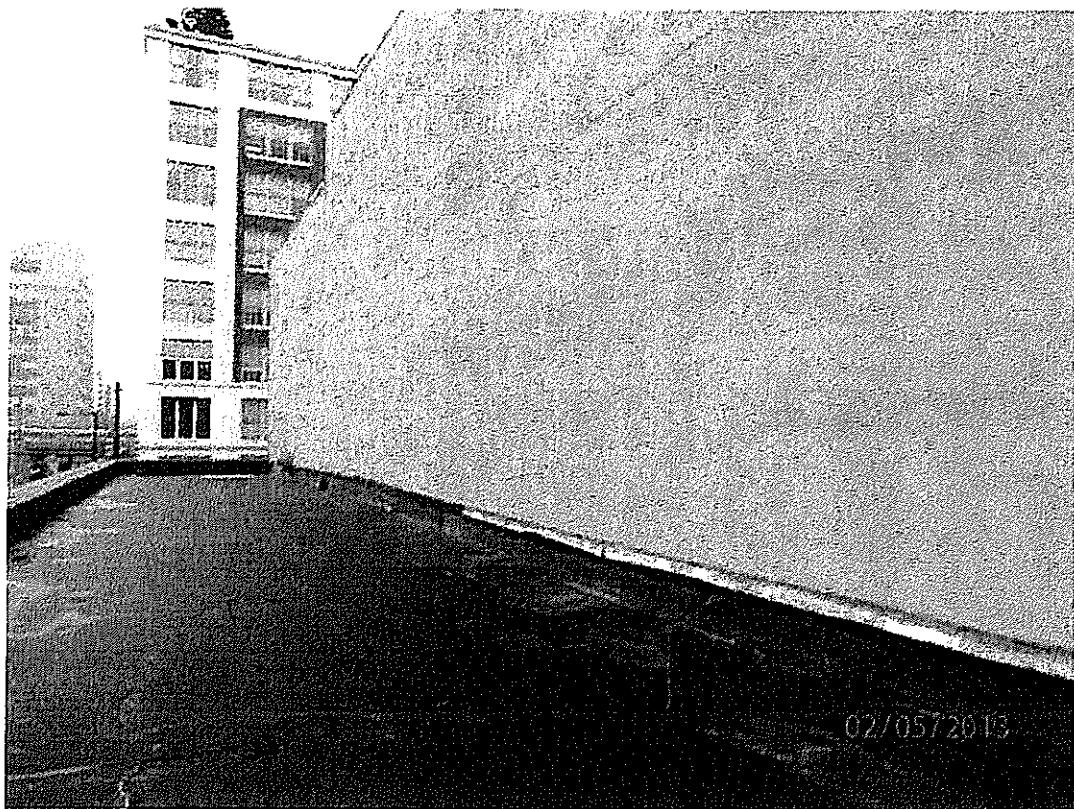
Roof View 2140 Market Street, Philadelphia, PA
